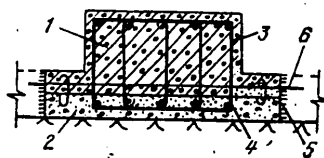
Cross Section of the Reinforced Concrete Column. 1--precast part of the column; 2--monolithic part; 3--reinforcement in the precast part; 4--extensions of the reinforcement into the monolithic part; 5--end mesh concrete form; 6--extensions of the reinforcement into the walls abutting on the column
